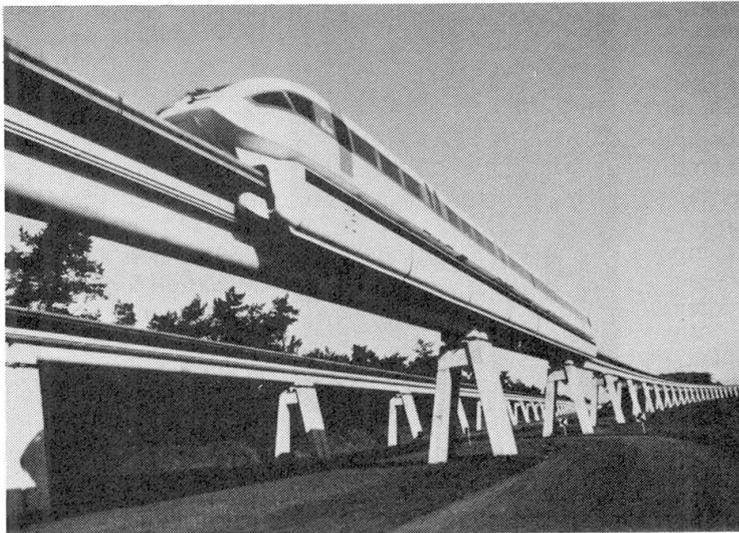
Concrete guideway for the TRANSRAPID Test Facility Emsland, 1st construction phase with MagLev vehicle
